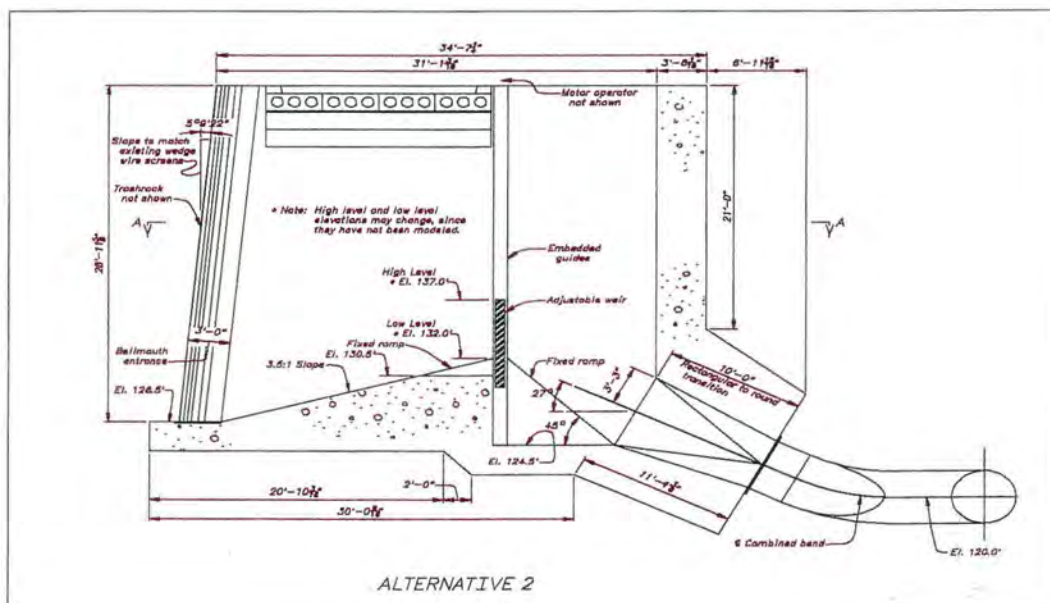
Elevation view of adjustable vertical weir concept for fish bypass.
